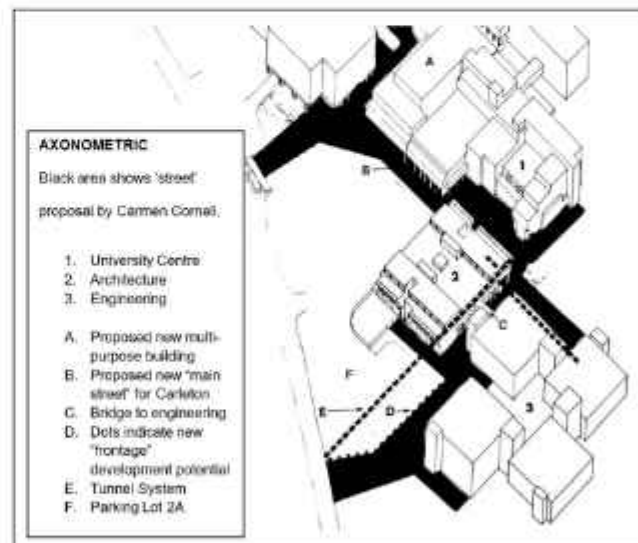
Axonometry shows the relationship of the Architecture Building with the surrounding buildings.²¹
